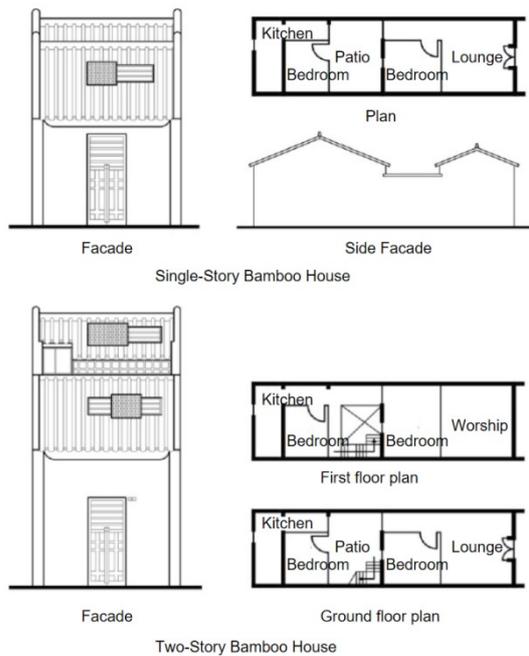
Typical Bamboo House in Qing Dynasty (Source: *Guangdong Folk House*, Lu Qi)
